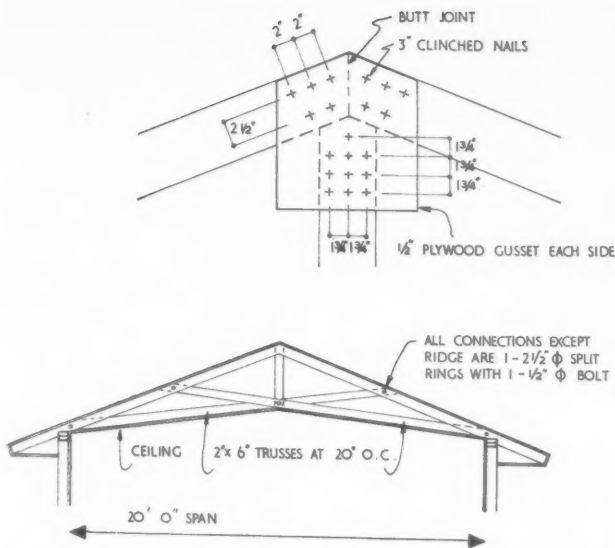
(left), scissor truss details (architects, Fleury, Arthur and Barclay). General detail below, and ridge detail, top. Fig. 11 (above), sketch of basement damp-proofing. Fig. 12 (below), cantilevered balcony detail.
